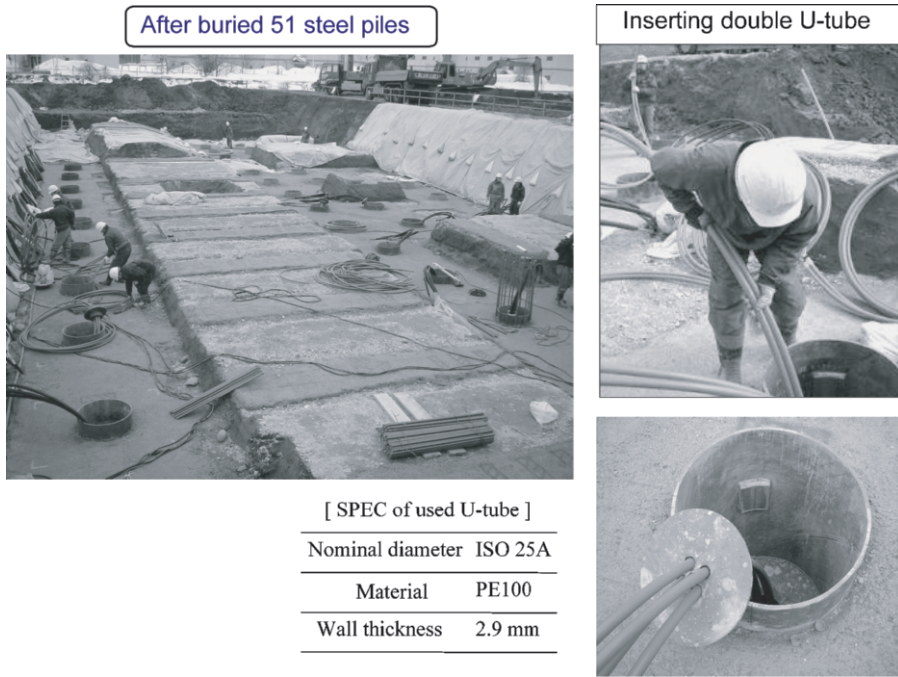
Layout of installed 51 steel foundation piles and inserting of two sets of U-tubes
